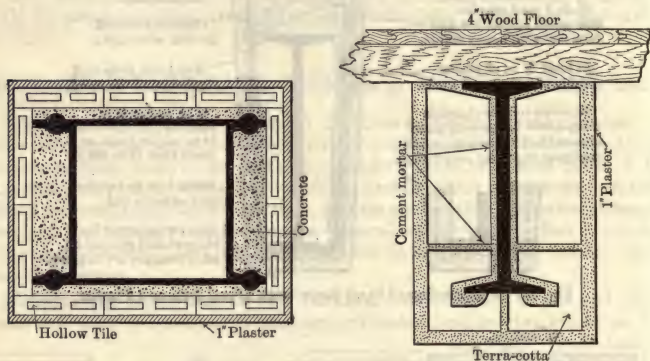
Fireproofing of Steel Columns and Beam with Tile
